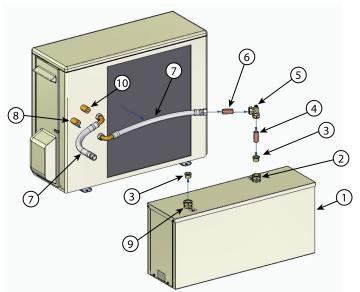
External volumiser connection to HPID6R32 heat pump (exploded image)
